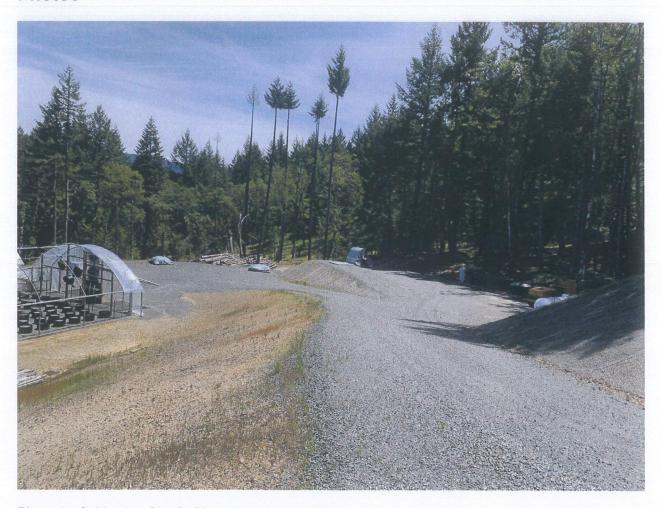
Cultivation Site B. Photo date June 1, 2022.
